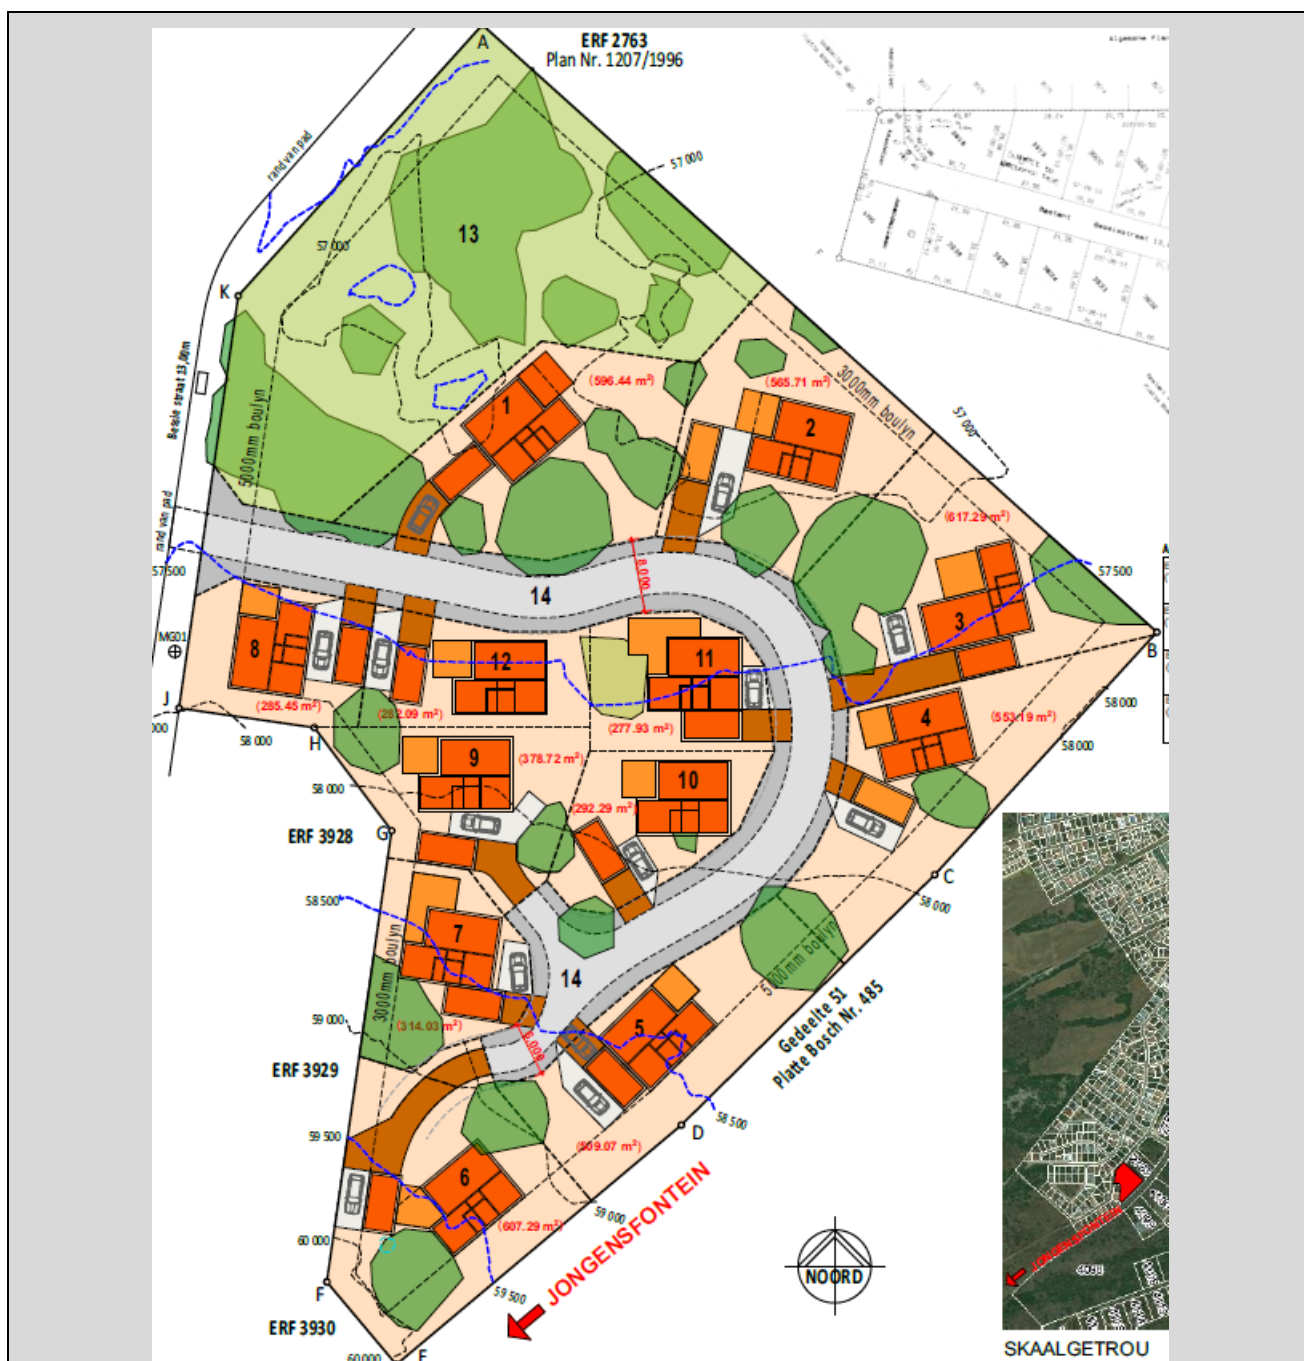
Site sensitivity of protected trees overlaid with layout plan (also refer to Appendix B for site plans) as surveyed by Bekker & Houterman Surveyors.
